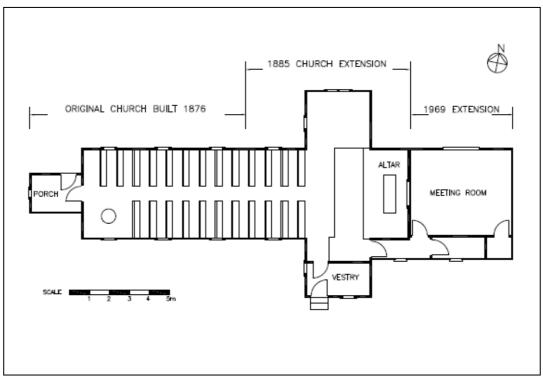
Plan of St Fillan's drawn by the architect for the conservation. Image provided by Sonya Linskaill.
